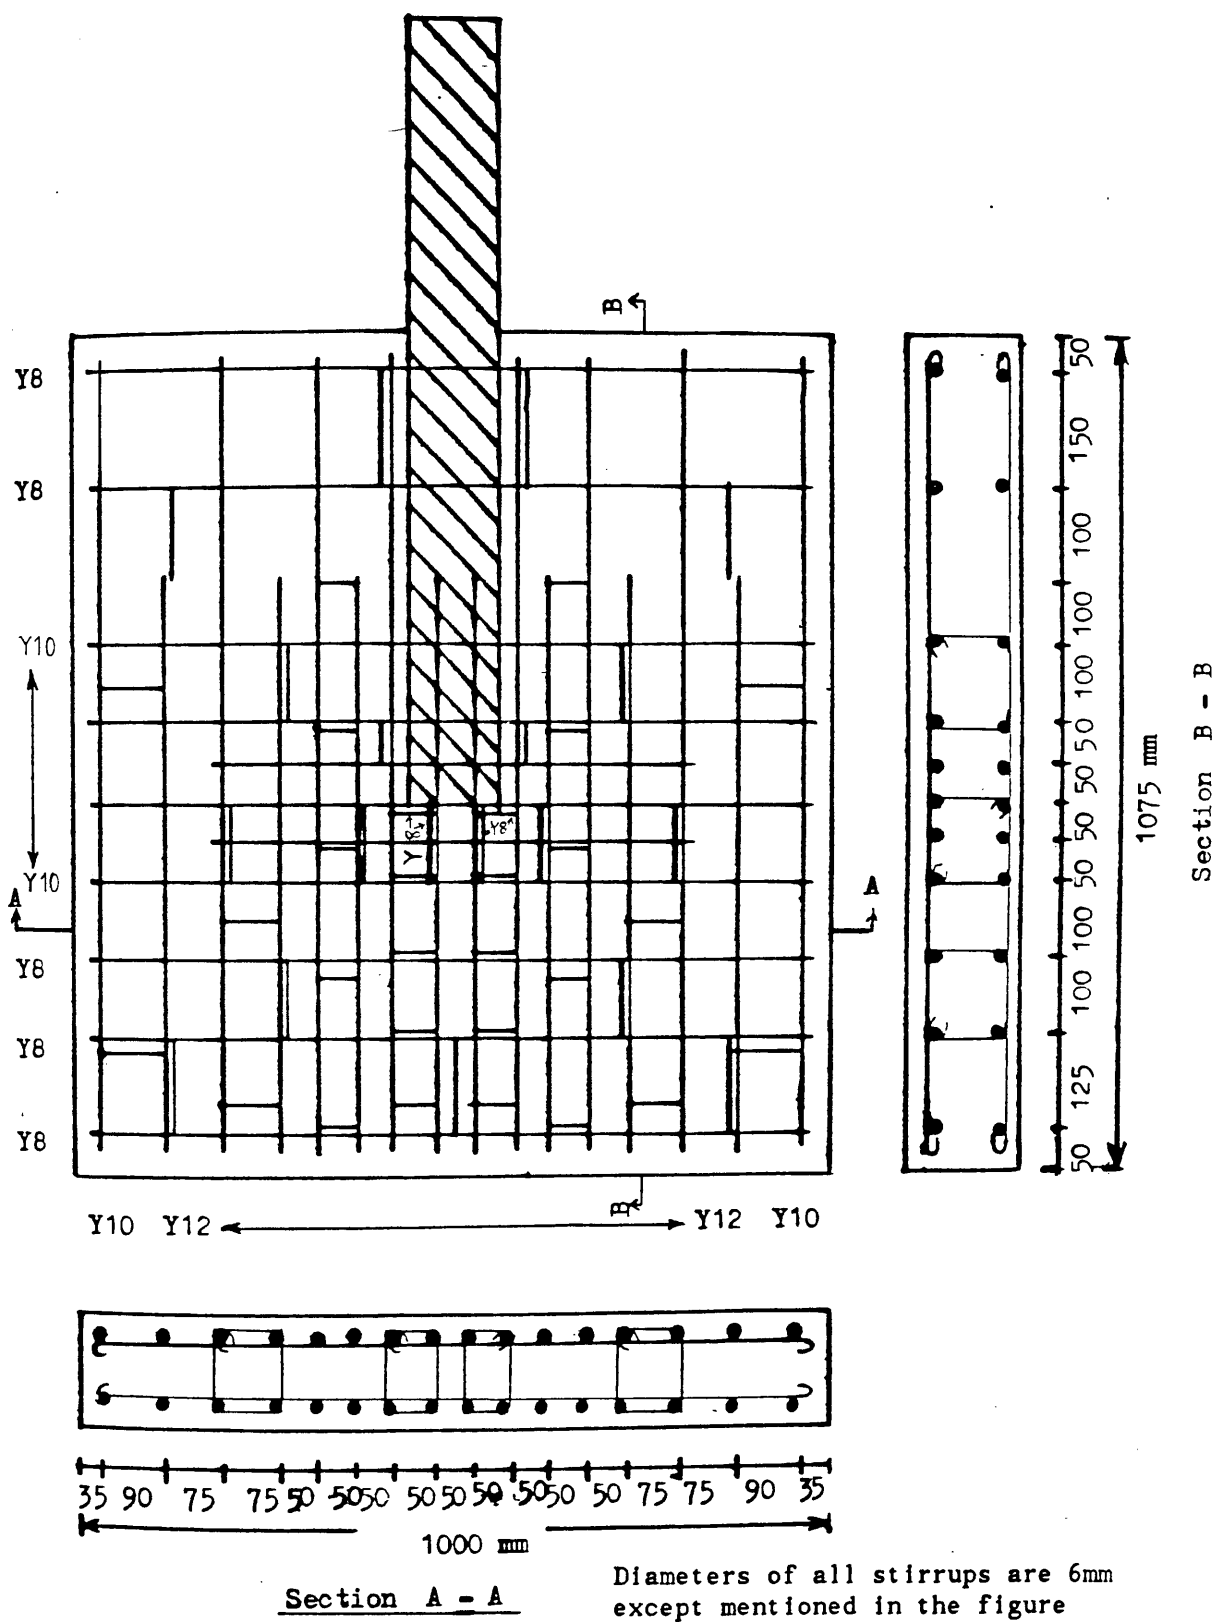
a) : Arrangement of top reinforcing bars including closed vertical stirrup in the slab of model MS7
